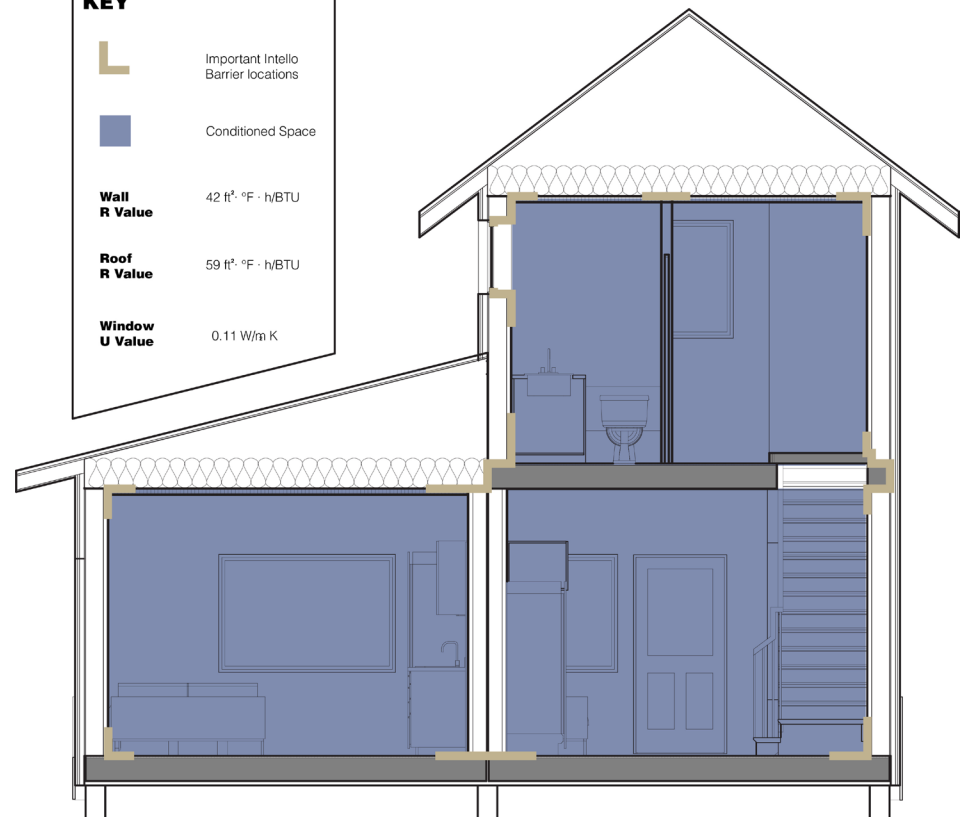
SPARC House section view showing critical vapor barrier wrap points
